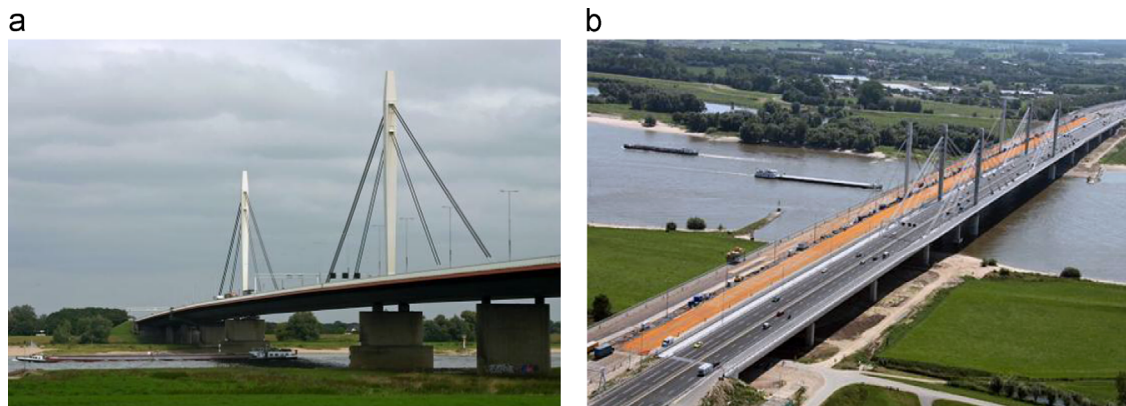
The Ewijk Bridge. (a) The original stand-alone configuration. (b) The new configuration with the existing deck (in refurbishment) and the new deck.
